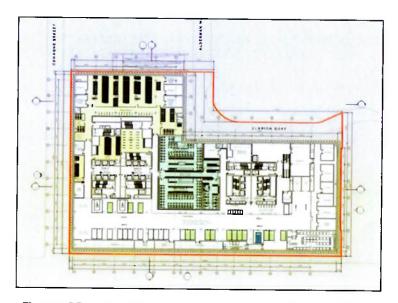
Proposed -1 Basement Plan [FFL = -5.075]
